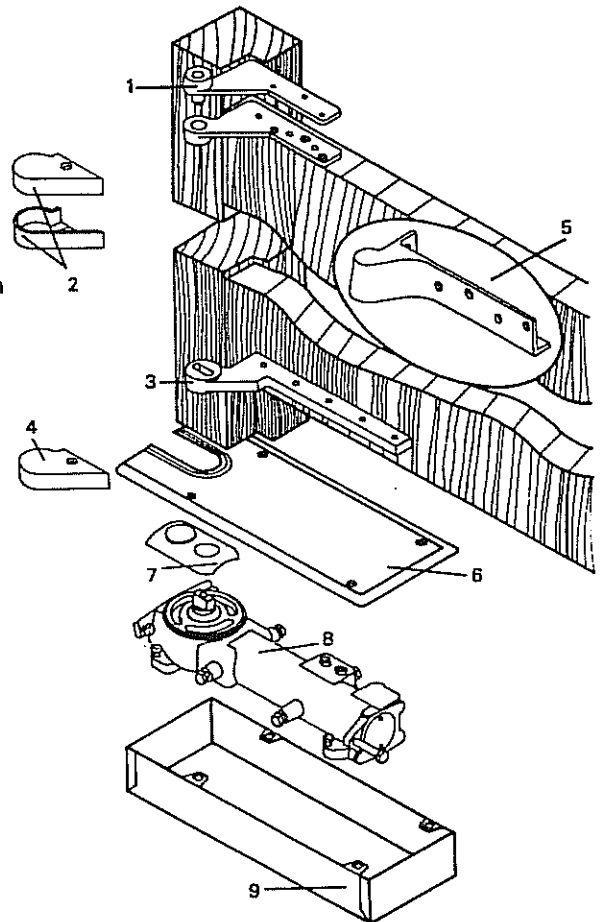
Typical single action floor spring component arrangement showing the alternative bottom strap or shoe fitting
